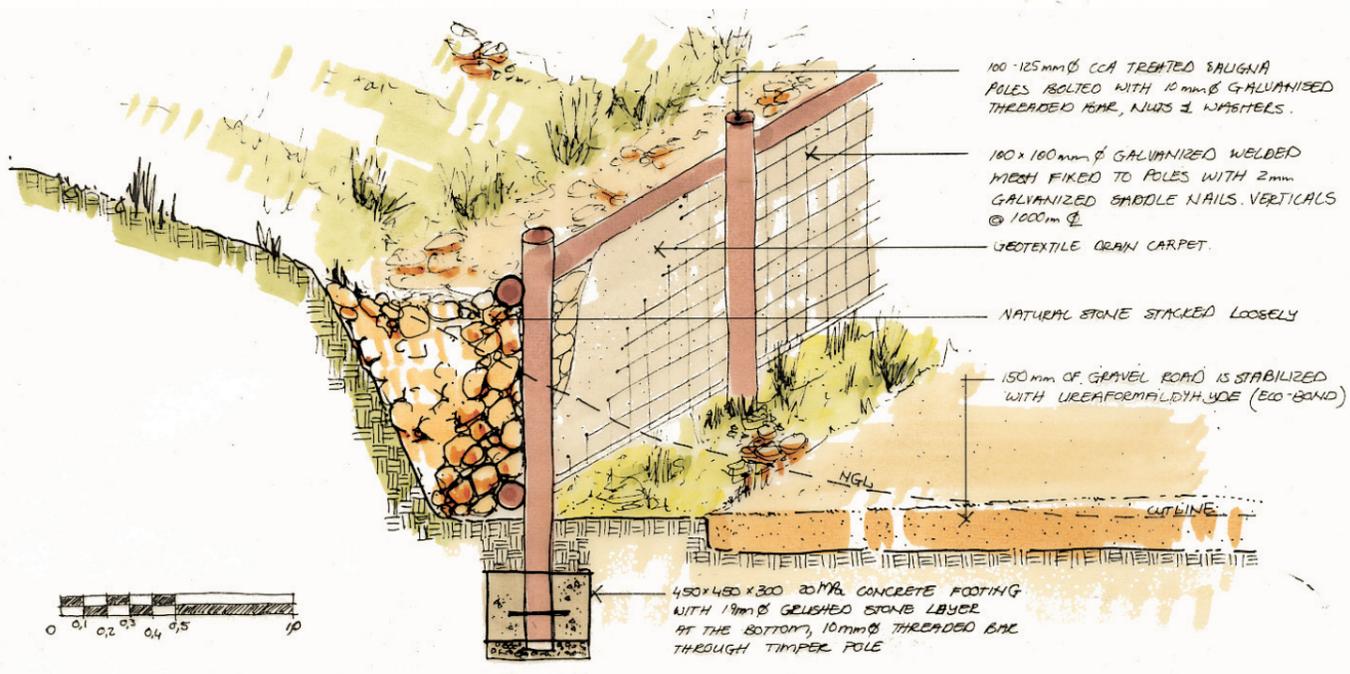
Retaining wall construction at waste recycling storage
